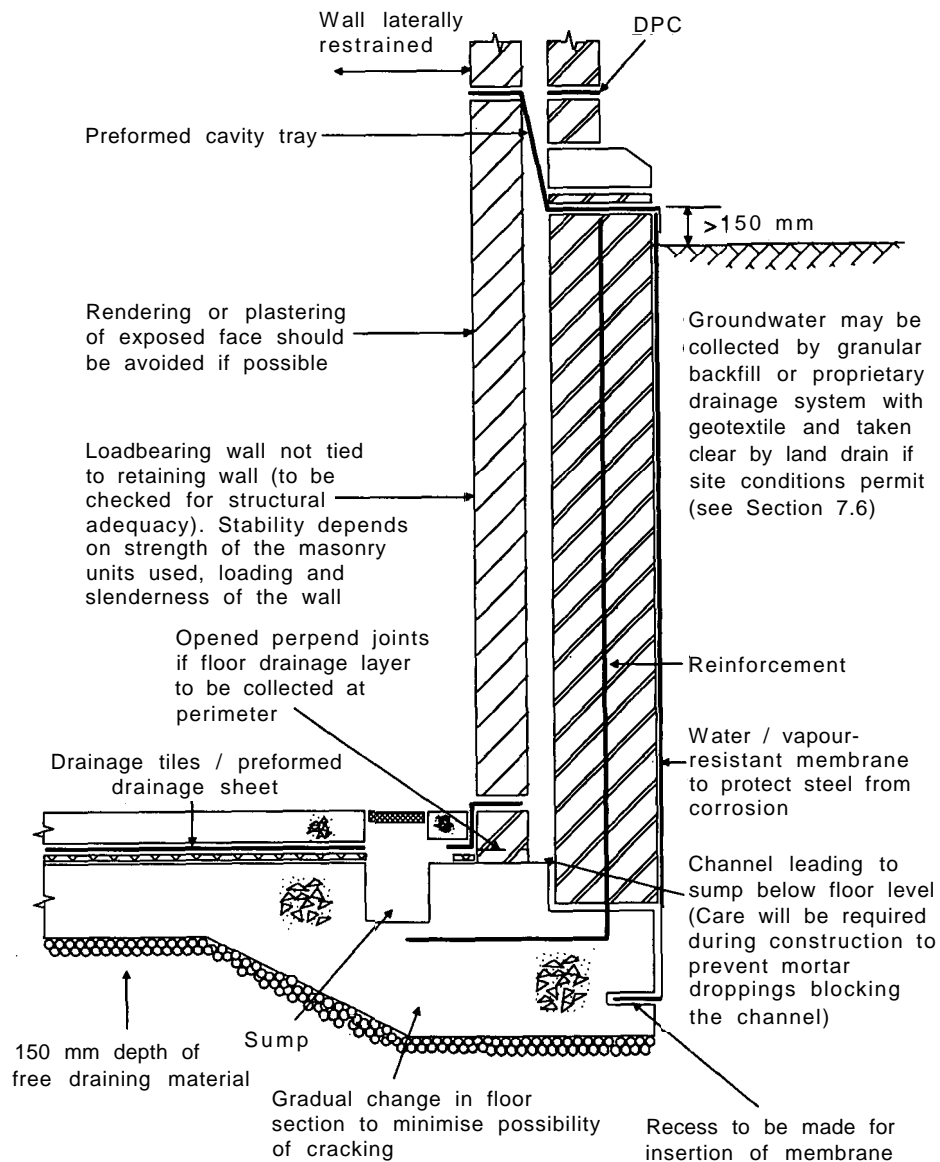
Masonry structure with drained cavity (Type CAe)
